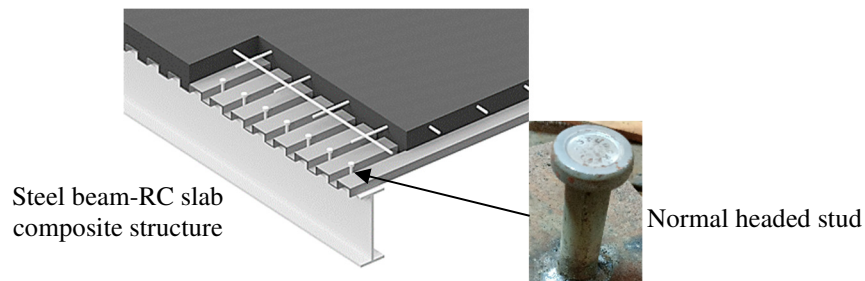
Typical arrangement of a steel-concrete composite connection [1]
